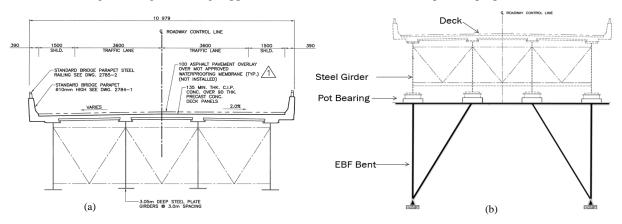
Sombrio Bridge: (a) superstructure typical section [9] (b)replaced EBF bent.
